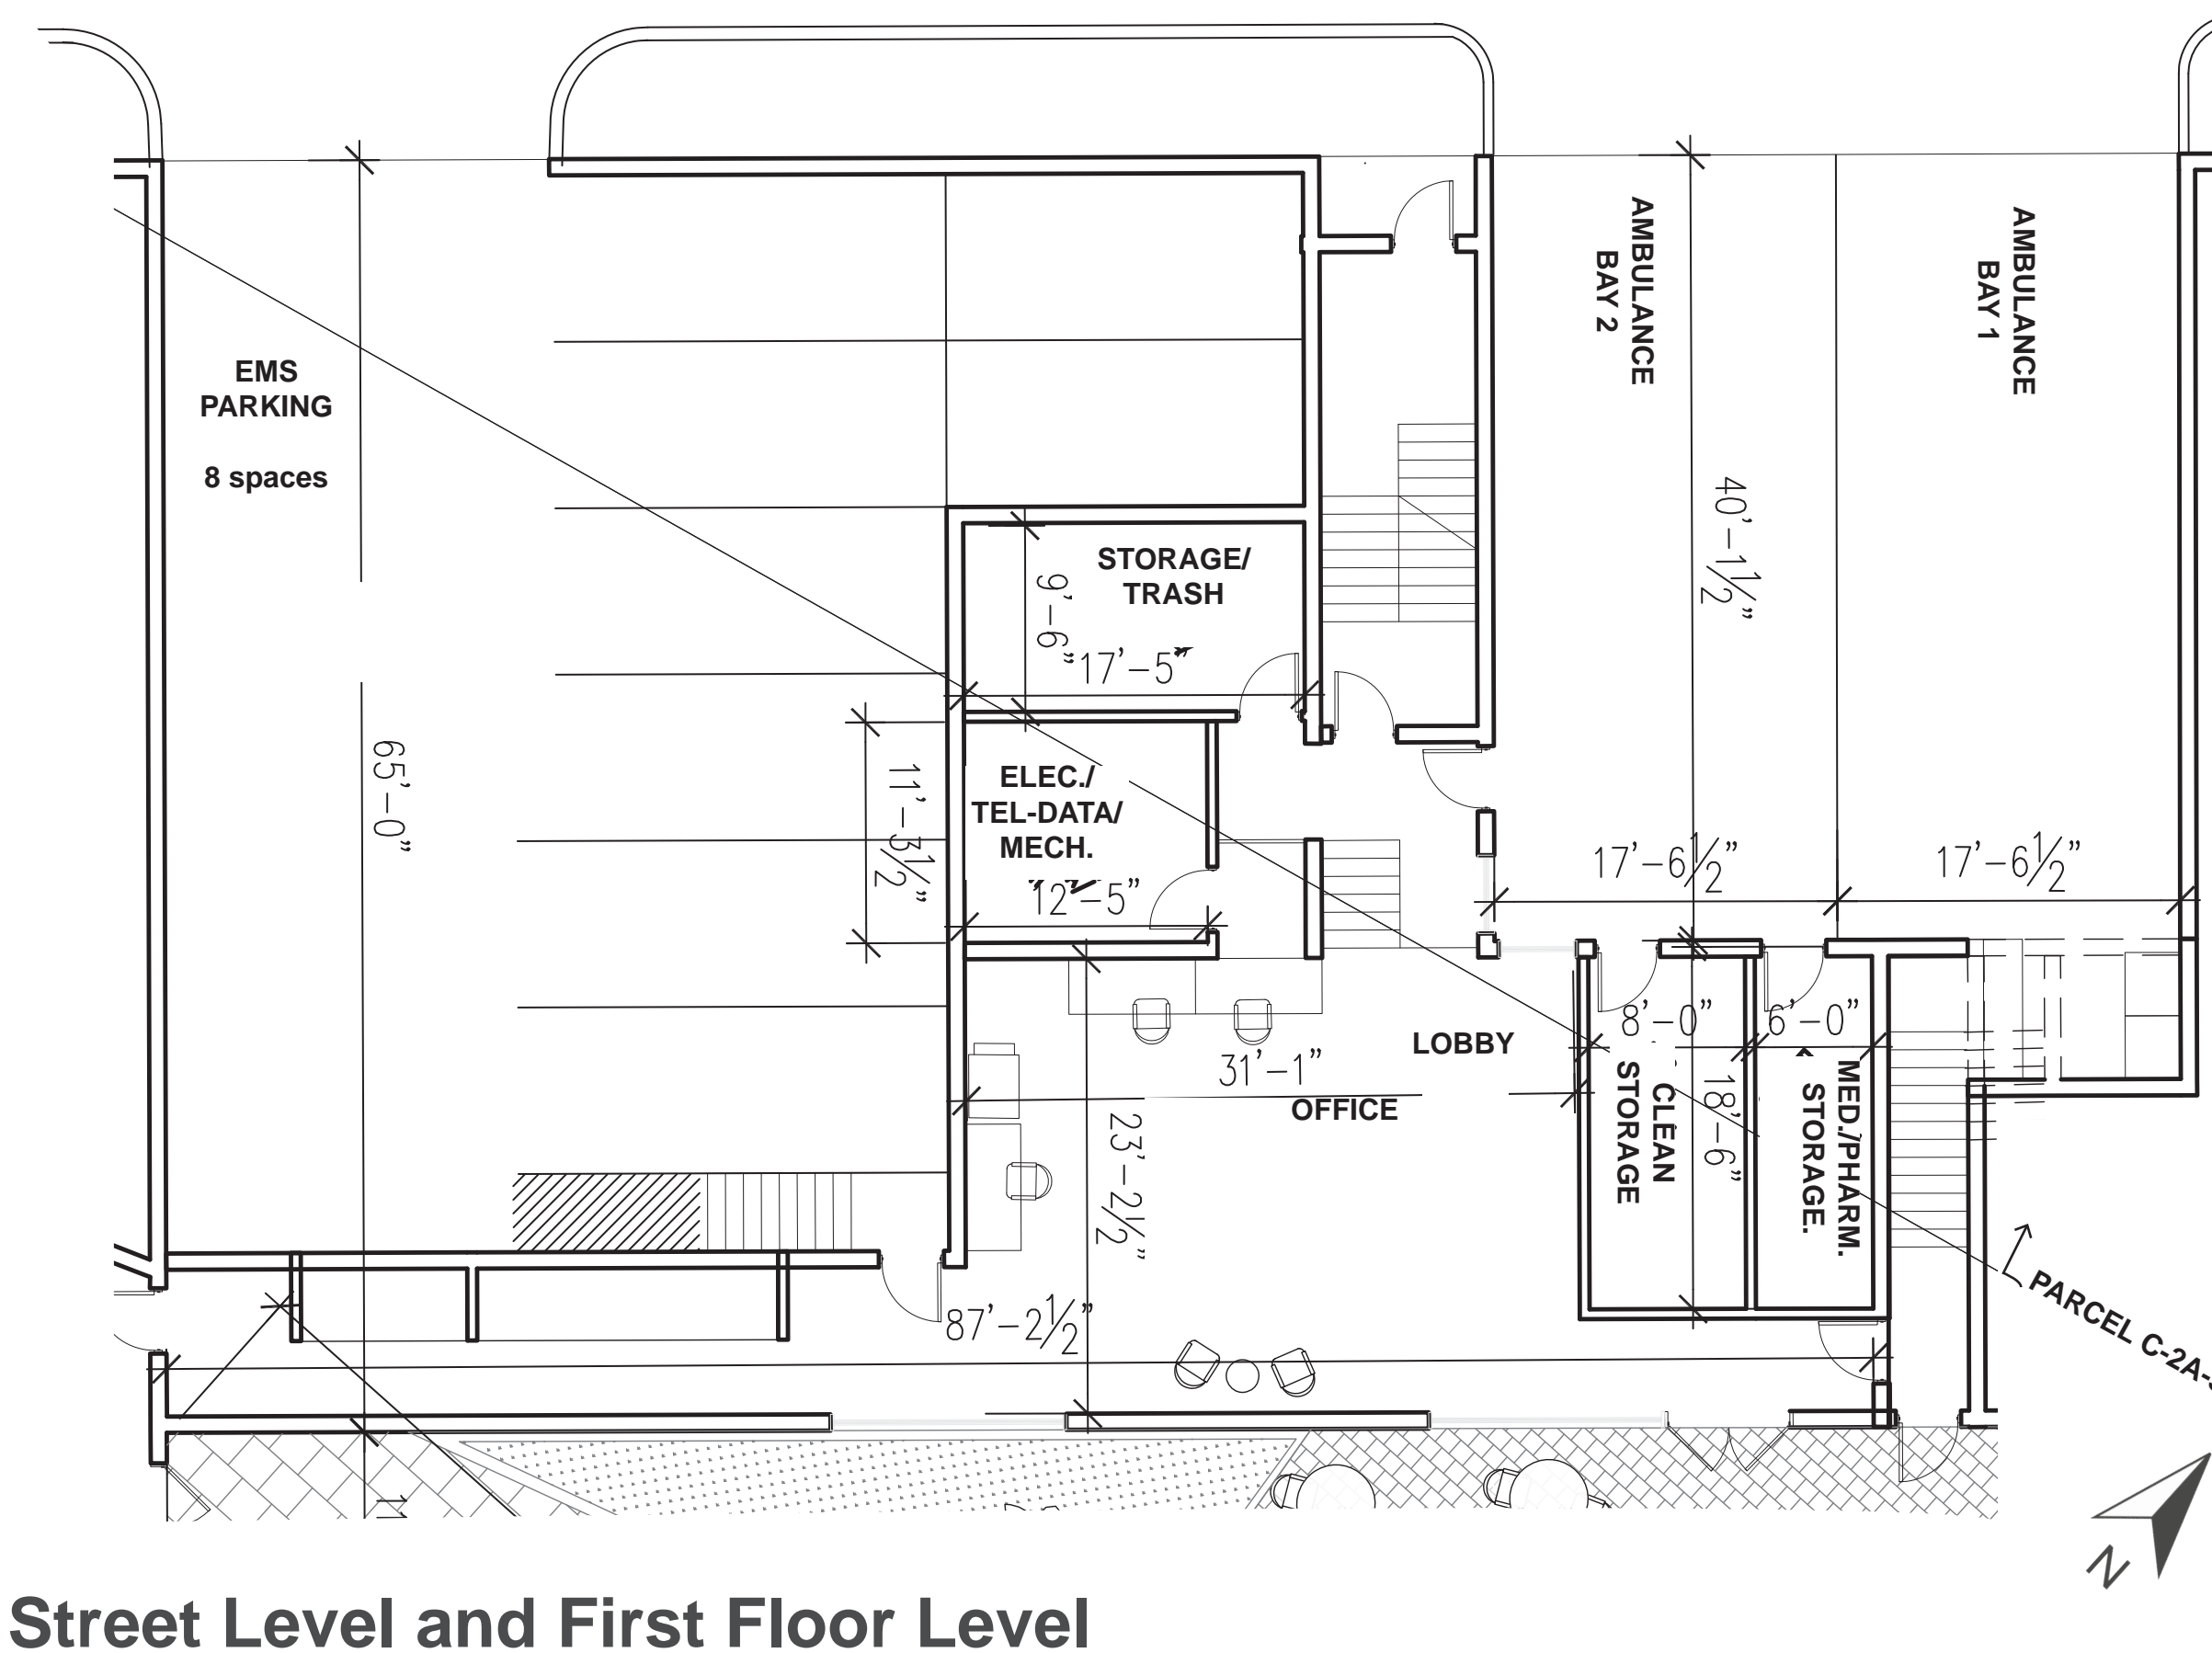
EMS SUBSTATION INITIAL SPACE PLANNING
